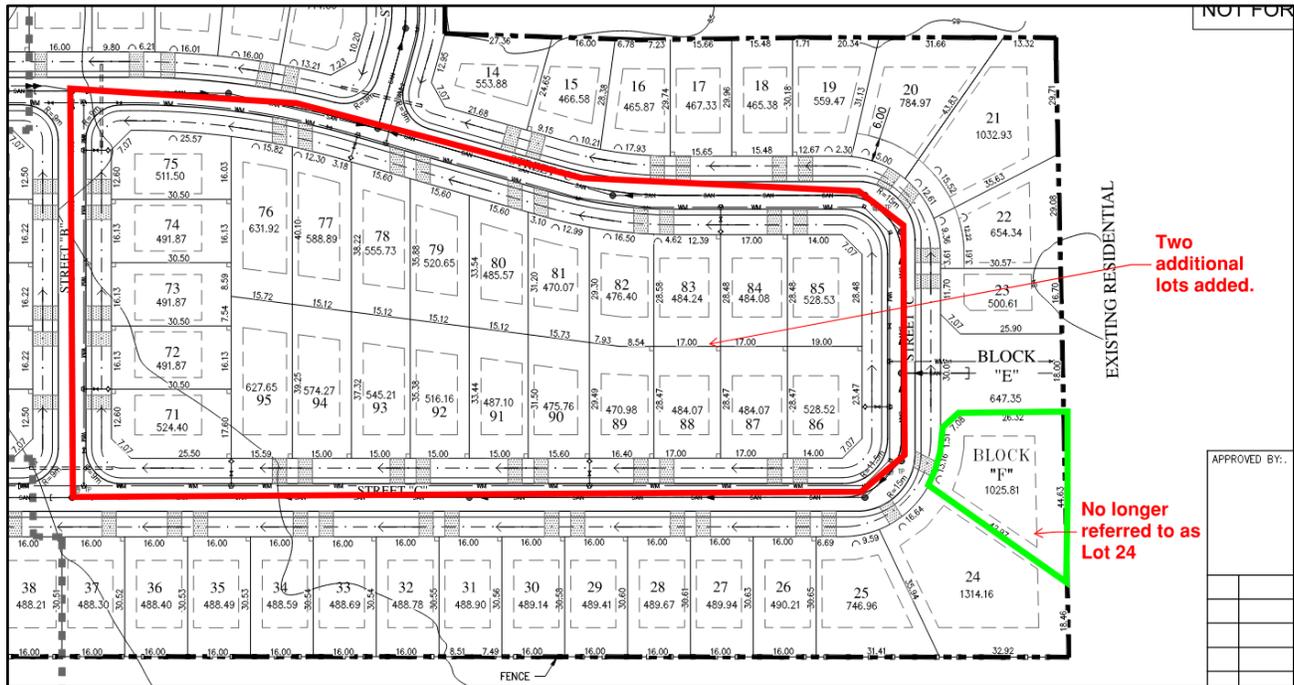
Proposed Draft Plan of Subdivision Revision 2021
